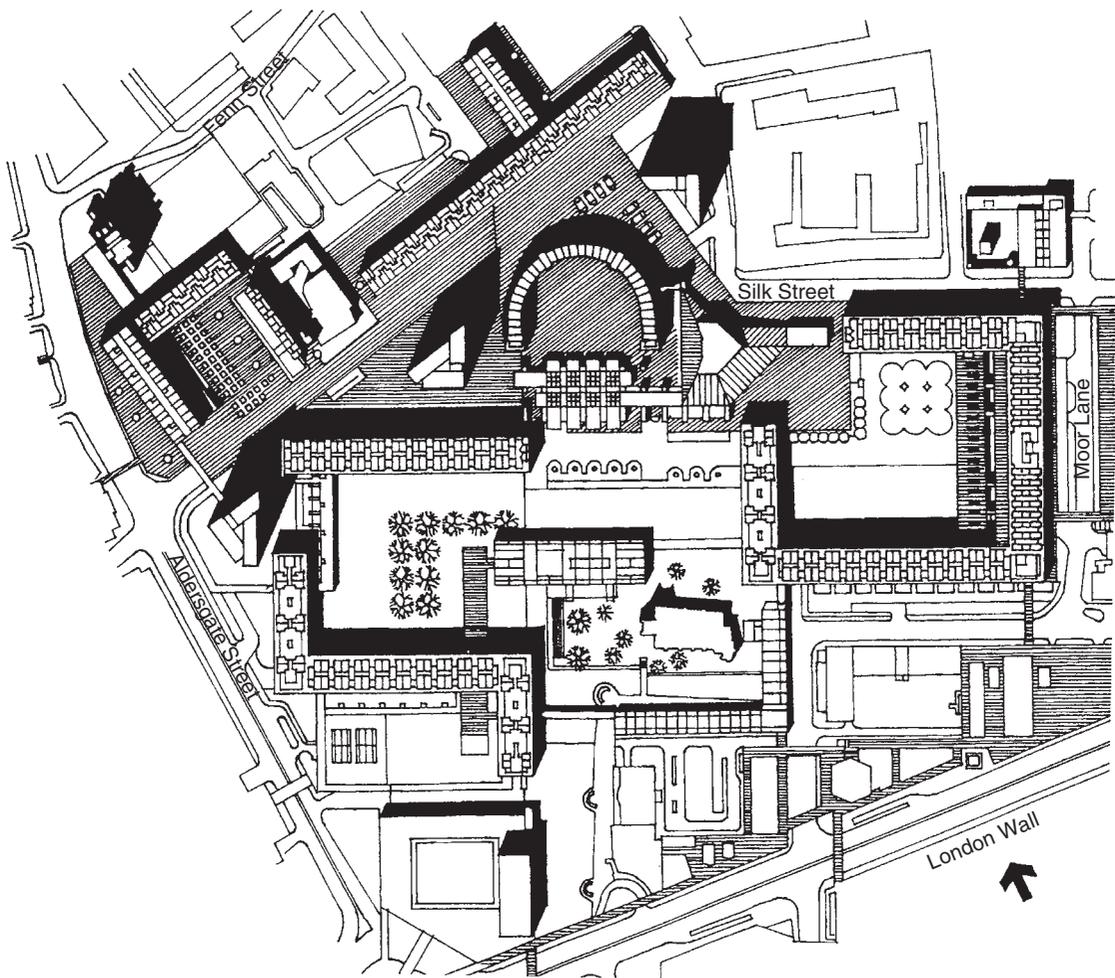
The Barbican: site layout (redrawn with approval from AR, 8/73, p. 79).
